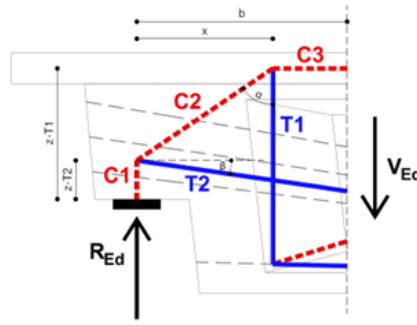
Strut and Tie scheme for half-joint element of Gerber beam
